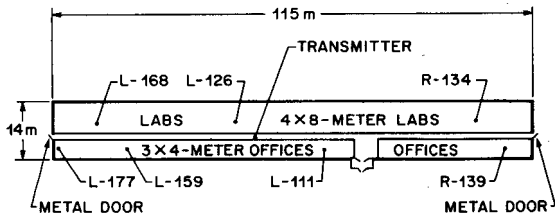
Plan of the first floor of AT&T Bell Laboratories' Crawford Hill building in Holmdel, NJ.
